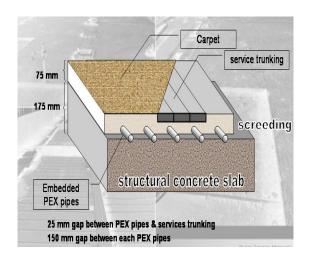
View of the Poly Ethylene crosslink (PEX) pipes installation on the floor slab.
